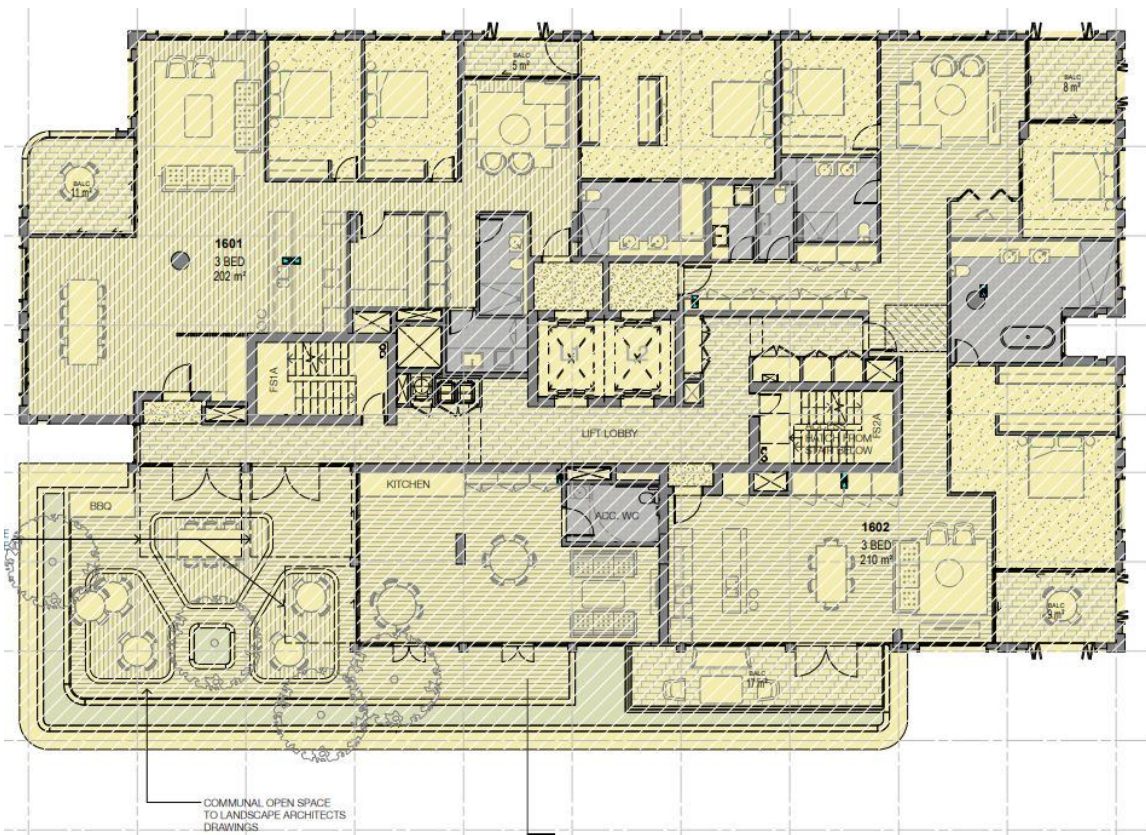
Level 16 floor plan containing the communal open space (Source: Applicant)
